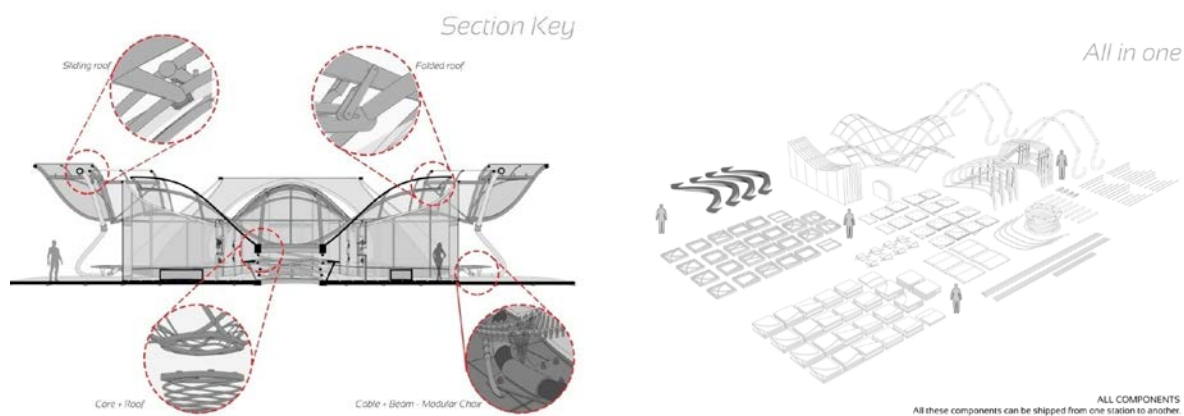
Component design of a travelling pavilion [credit: Raymond Leonhart]
